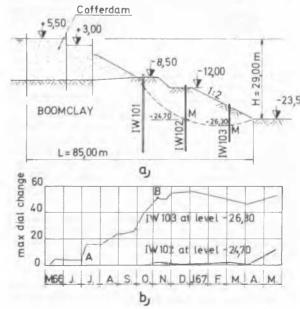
Front-slope of the construction pit of the ventilation building (R.B.) at Antwerp.
